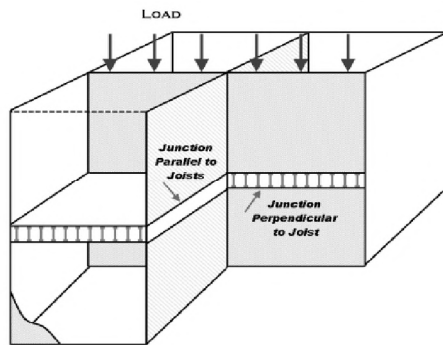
Cut-away sketch showing the bearing walls of the specimen to which a static load can be applied.
